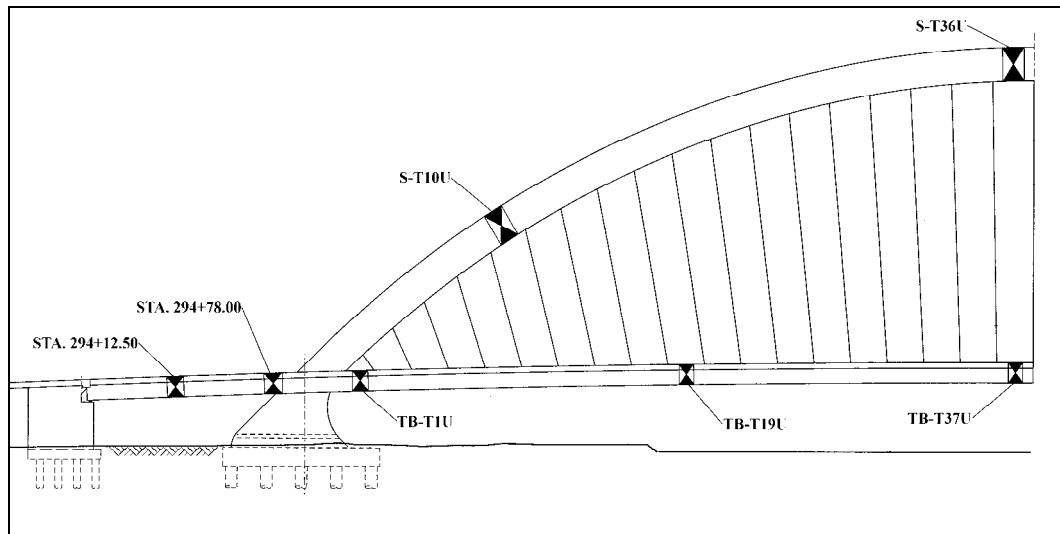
South Data Acquisition System Locations (Modified IRIB Specifications and Construction Plans)
